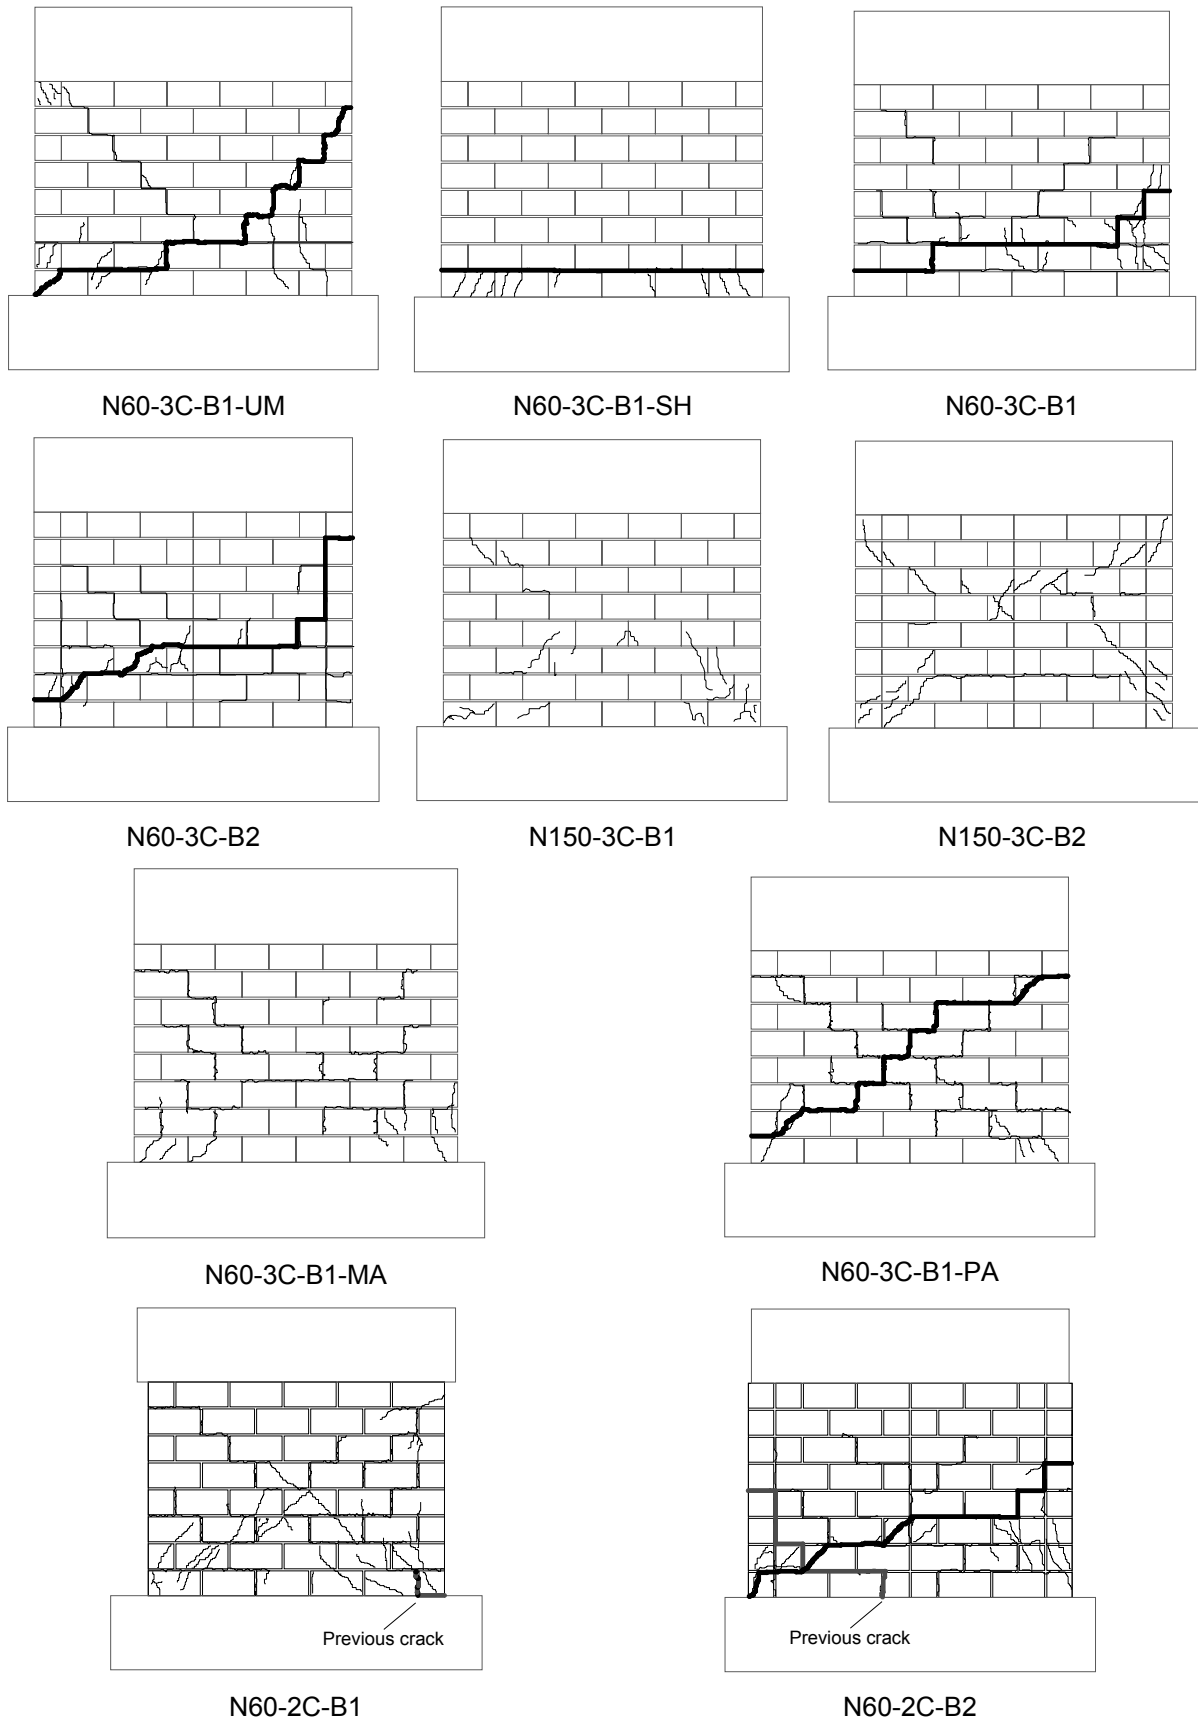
Cracking patterns of masonry walls (thick lines indicate the plane of sliding).
